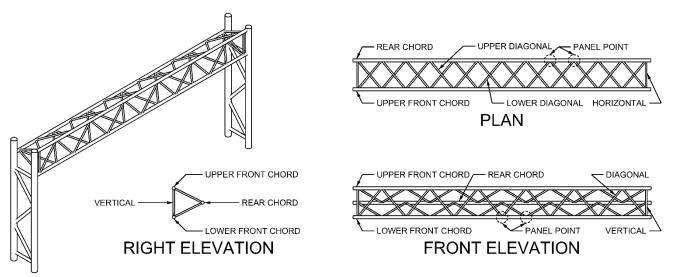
Overhead Span, Tri-Chord Space Truss
